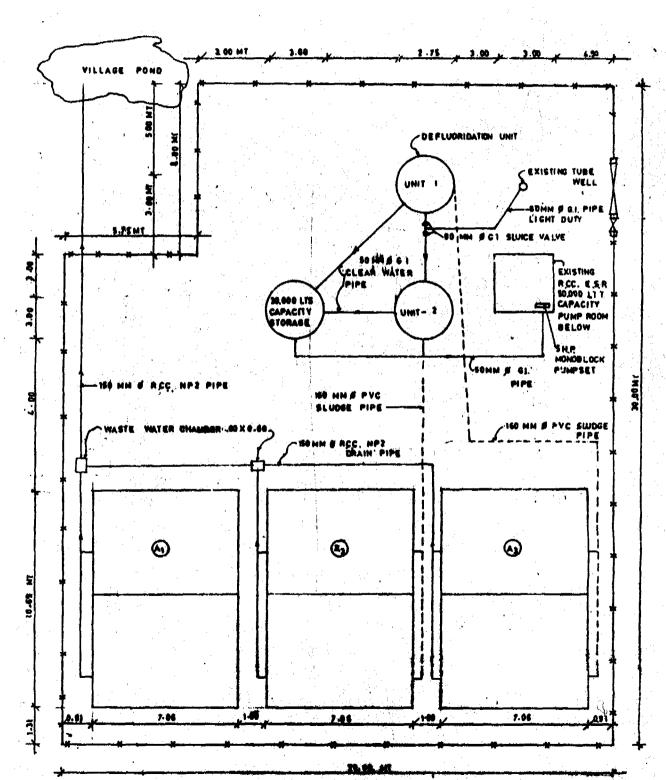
LAYOUT PLAN WILLAGE - TAVABIA
